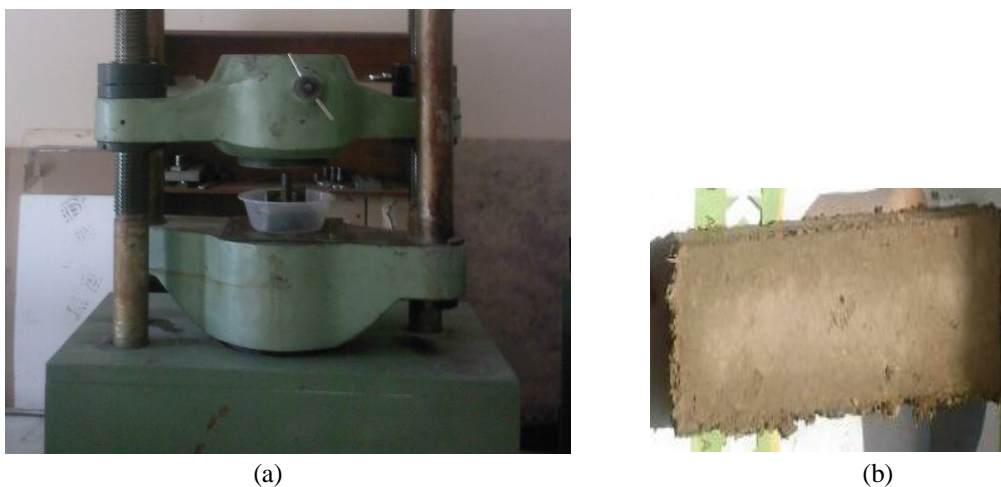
(a) Testing machine (b) Paper-based building specimen
